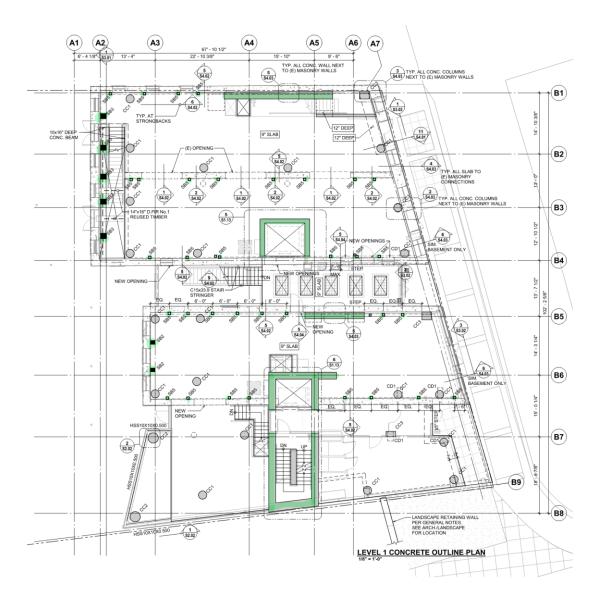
Traditional Seismic Upgrade Strategy with New Shear Walls and Strongbacks highlighted
